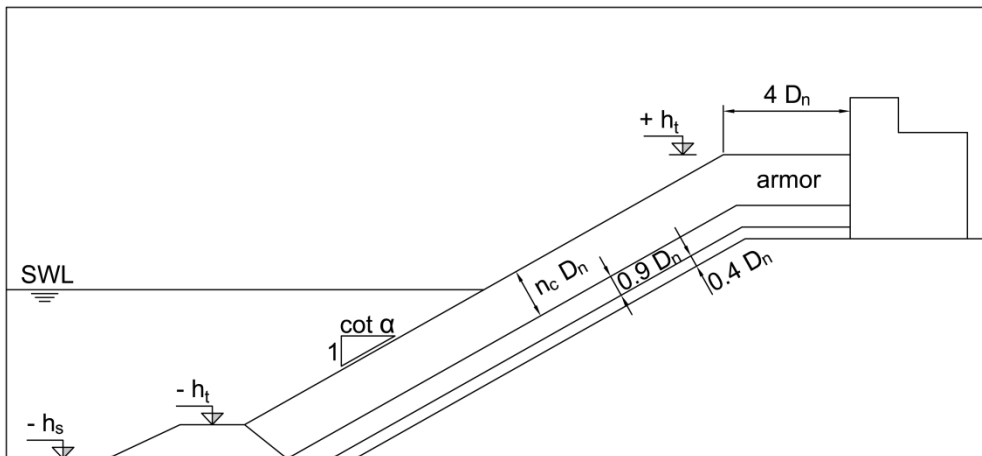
Breakwater cross section used in the parametric study of construction costs (Corredor et al., 2008).
